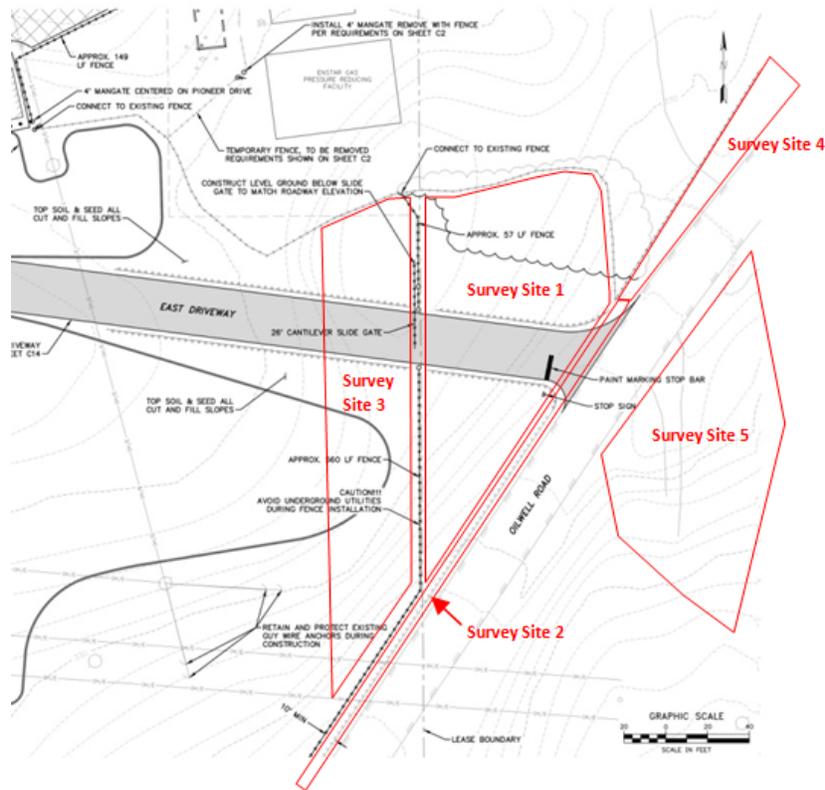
Non-Native Plant Survey Sites Based on ML&P Site Drawing.
